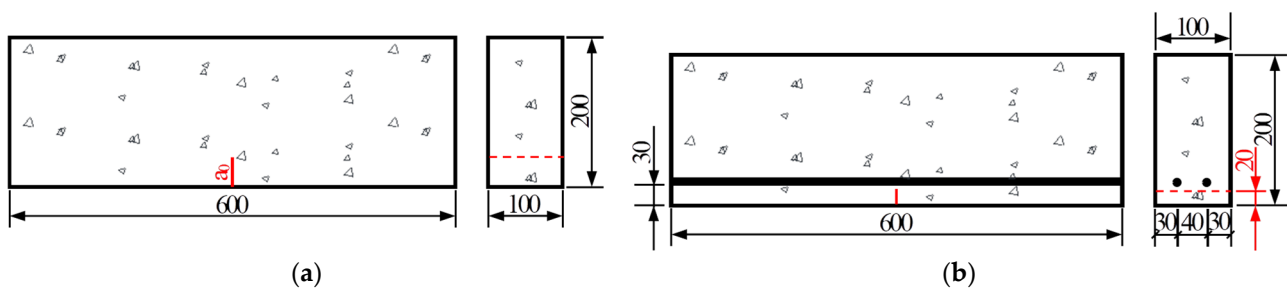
Schematic diagram of single-edge notched beam (SENB) specimens (dimensions in mm): (a) Plain concrete specimens (a_0 varies between 20–100 mm as shown in Table 2); (b) Reinforced concrete specimens.
